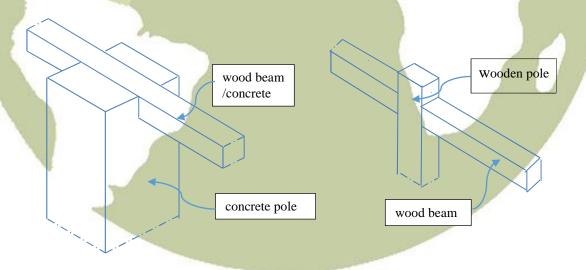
Types of Construction which Adaptive Floor with Wetlands and Local Climate
